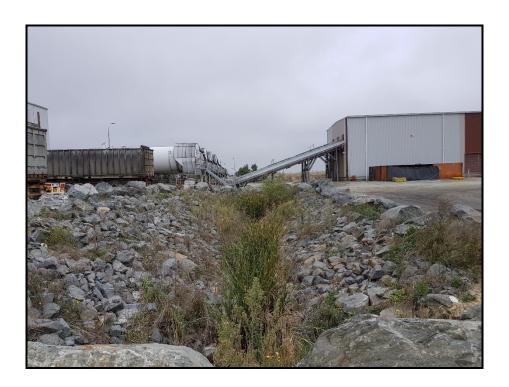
Looking south along a stormwater drainage swale towards the Refining Building on the right. 24/03/22
